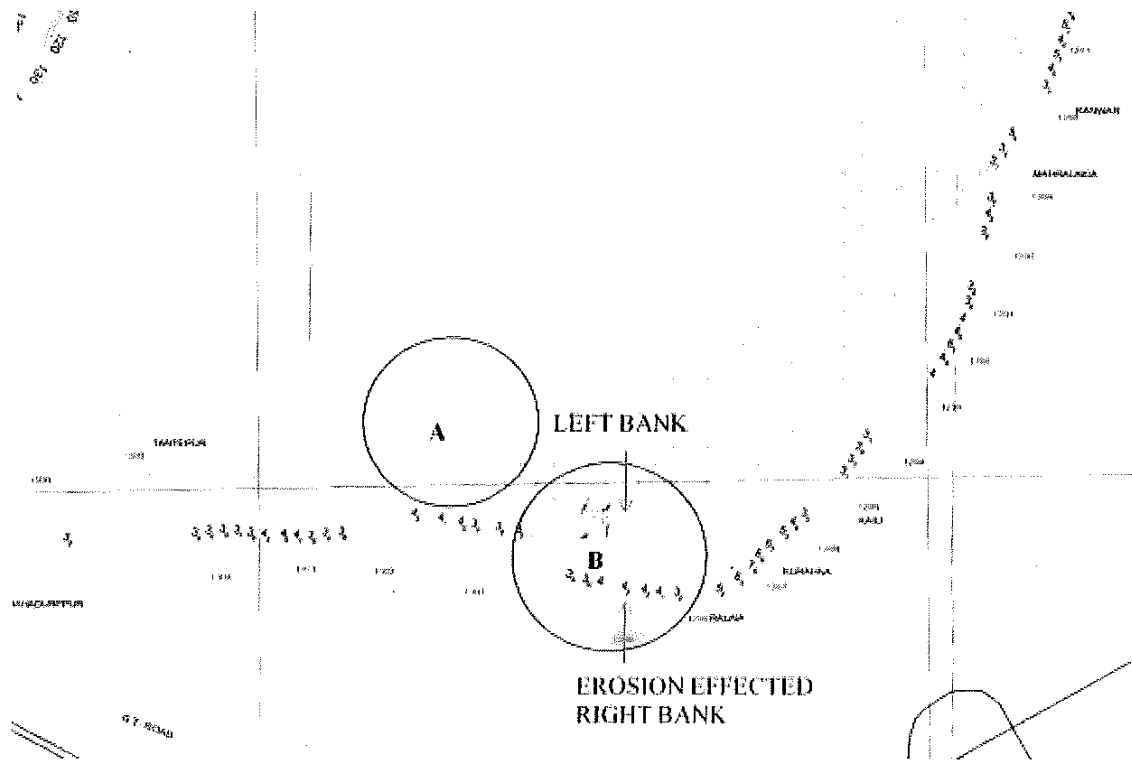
Plan view of Nakhwa Site in the Ganga river showing location (A) and (B)
